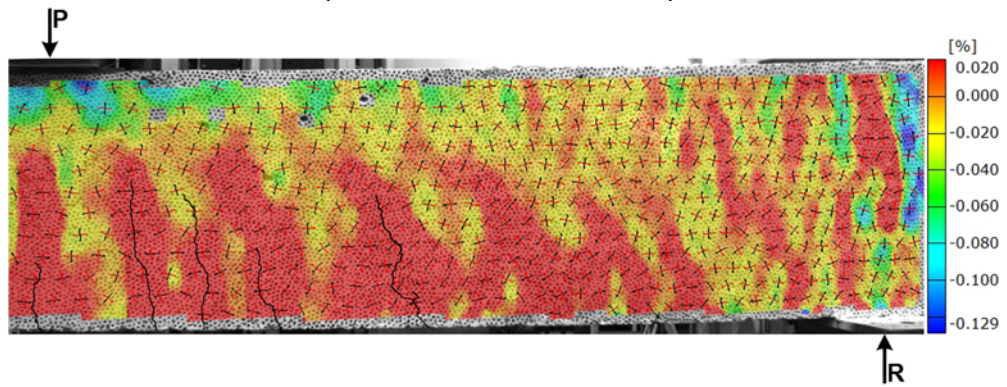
Scaled full-field concrete longitudinal strain ( $\epsilon_x$ ) across shear span for specimen RC18a at load 45 kips
